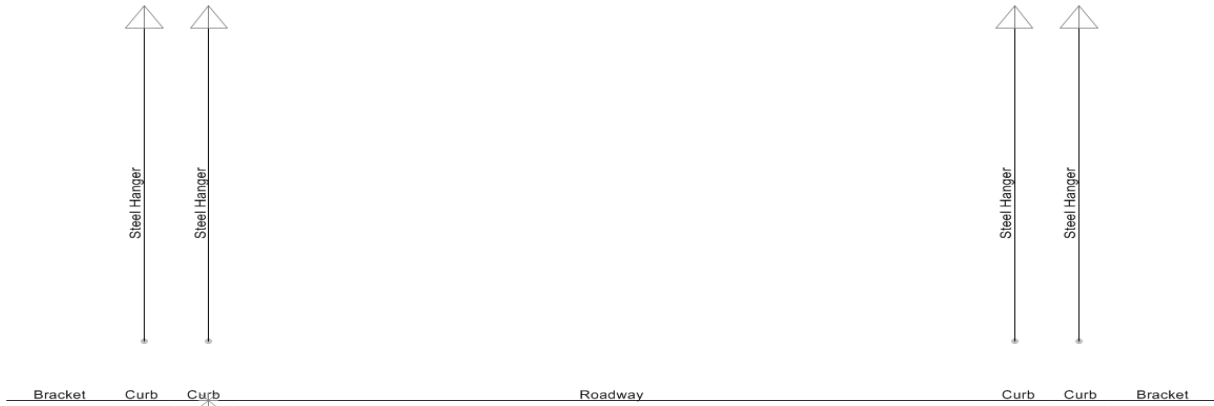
Beam and Steel Hanger 1 Model (SAP 2013)
